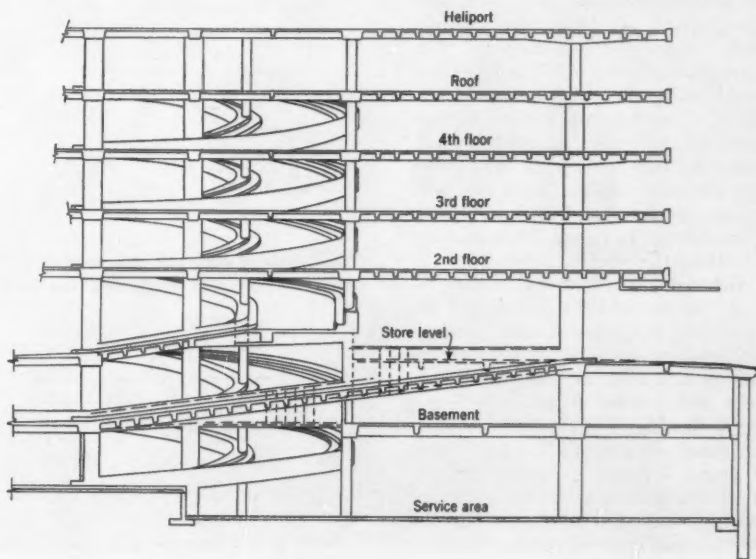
In typical section through Ten Ten Garage, note floor, column and ramp system; cantilevered floors around perimeter of building (upper right); and ring of cast-in-place concrete piles around perimeter of basement (represented by one at lower right).
